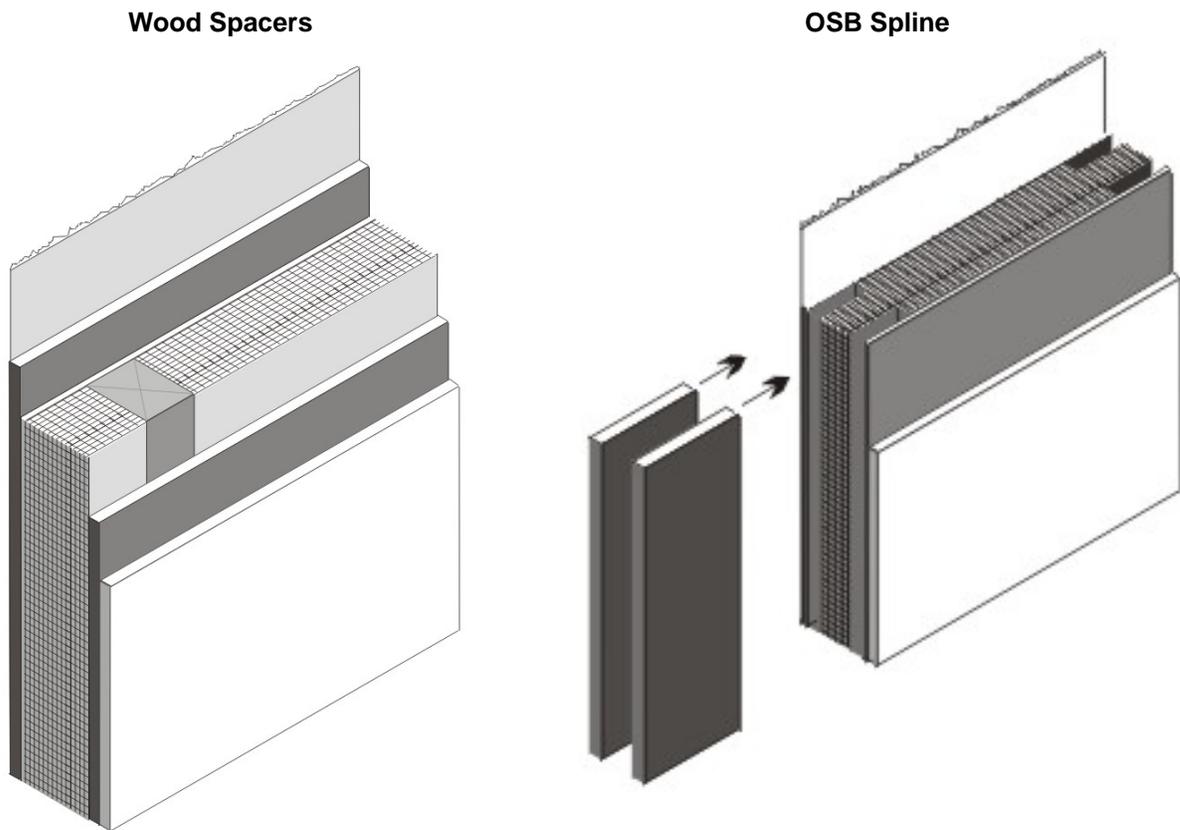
Structurally Insulated Wall Panels (SIPS)
